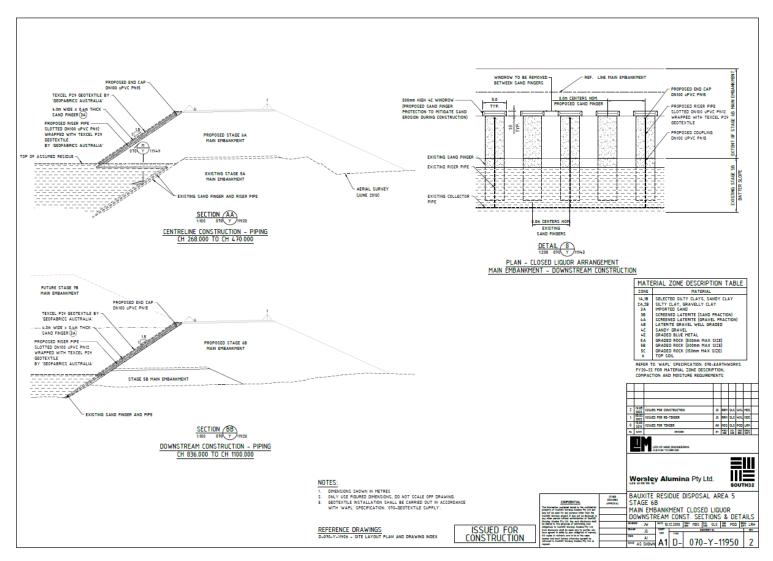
Diagram of construction works closed liquor system detail on downstream embankments
